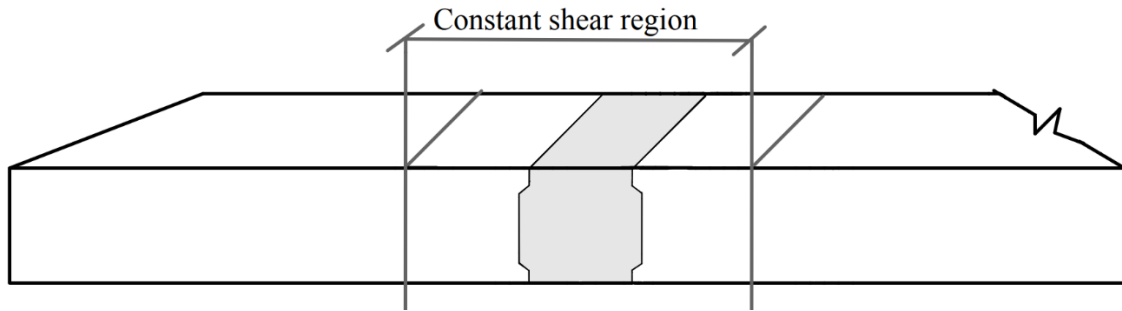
Crack Propagation for Proprietary Short-Term Specimen at 30 % of Final Load
